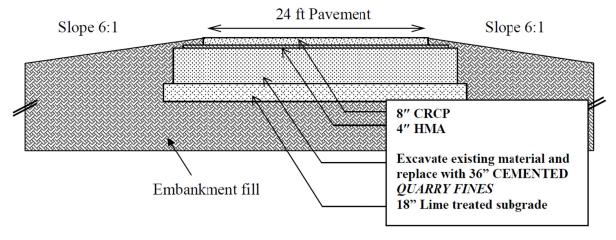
Typical test embankment with CQF as a base material supporting pavement in Arlington, Texas (Puppala et al. 2012).
